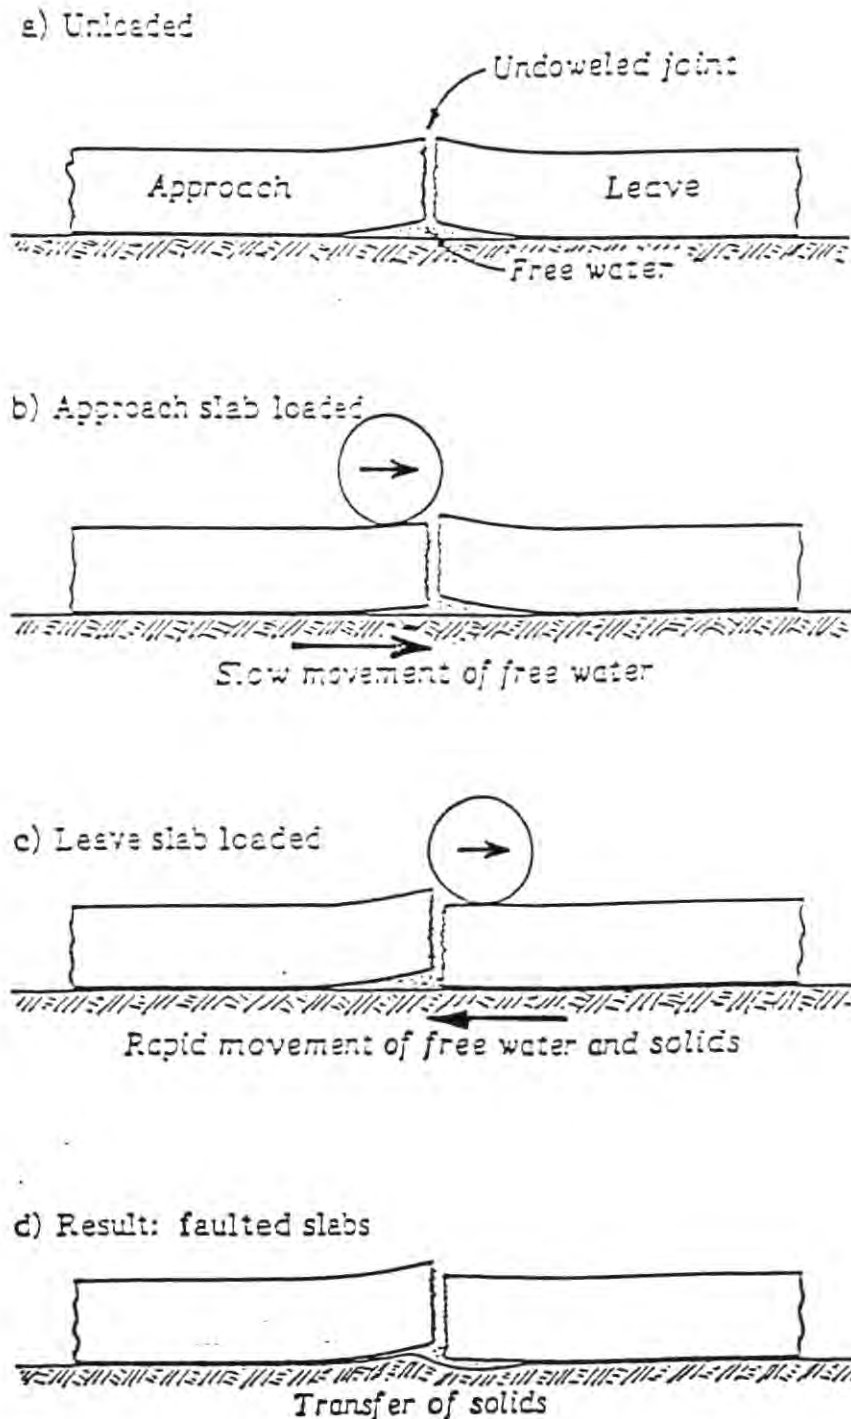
Development of Faulting in Undoweled Concrete Pavement Built Over Cement Treated Bases (5).
